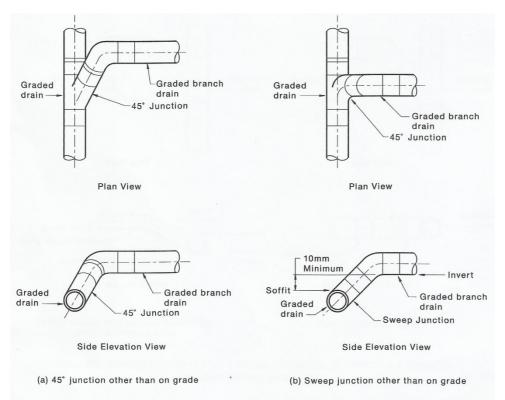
Typical arrangement for branch drains entering main drain other than on grade
